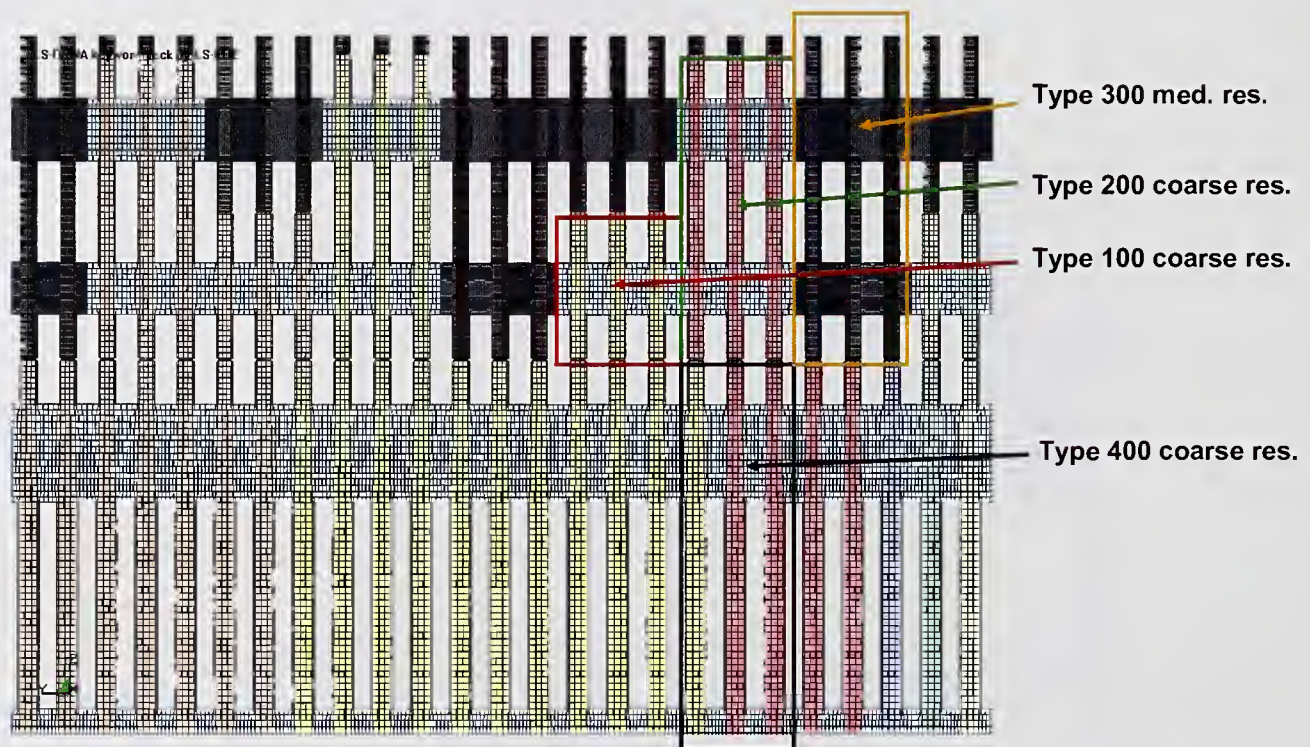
Detail of the WTC 2 impact zone exterior column panels.
